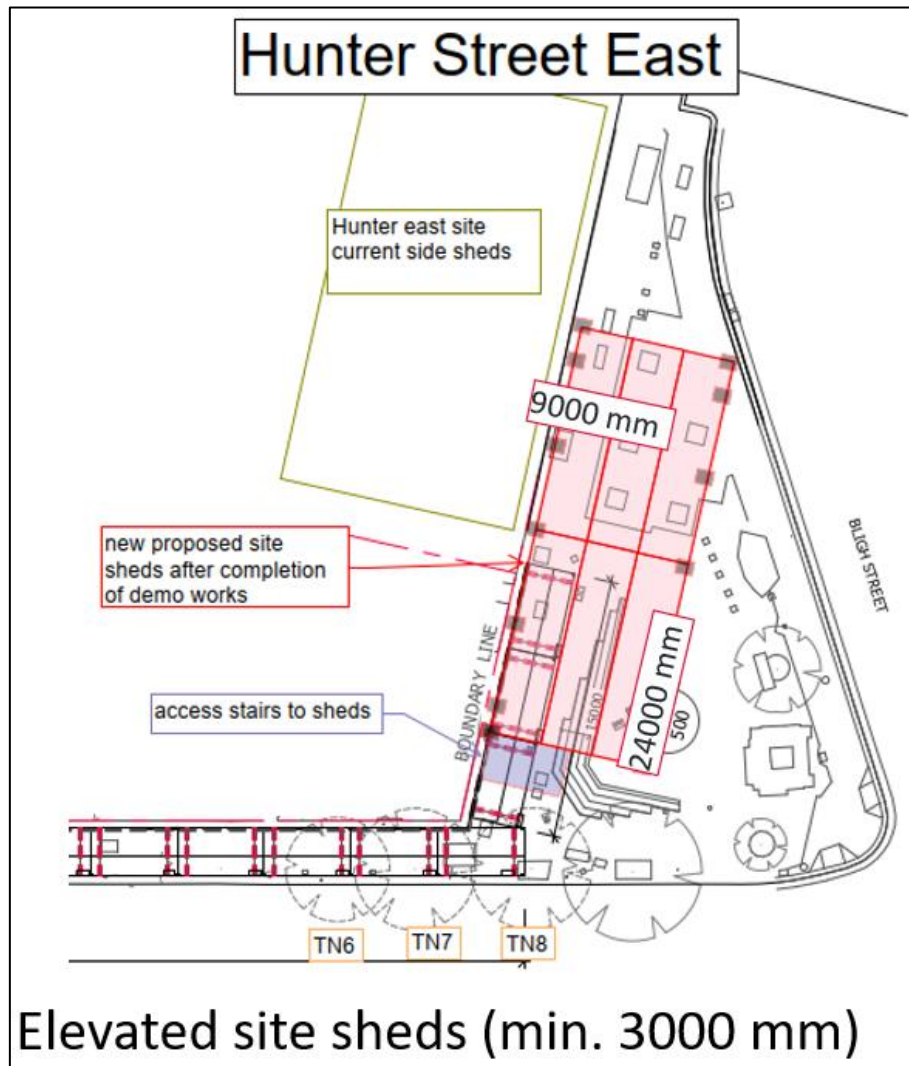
Proposed site shed location on Bligh Street, near to its intersection with Hunter Street.
